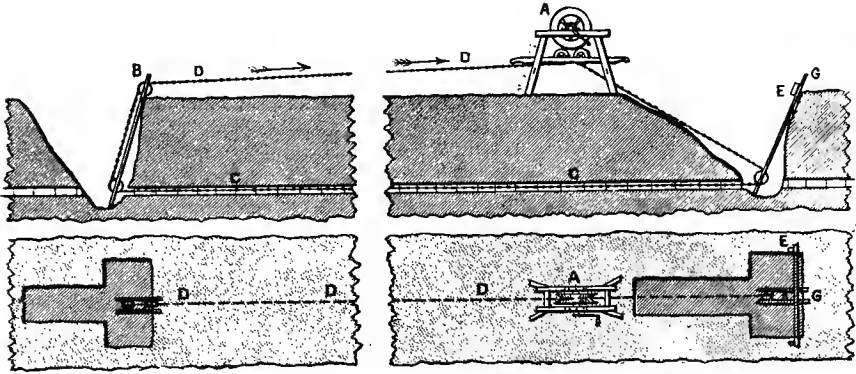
Section and plan of drain in process of being cleaned, showing arrangements.
